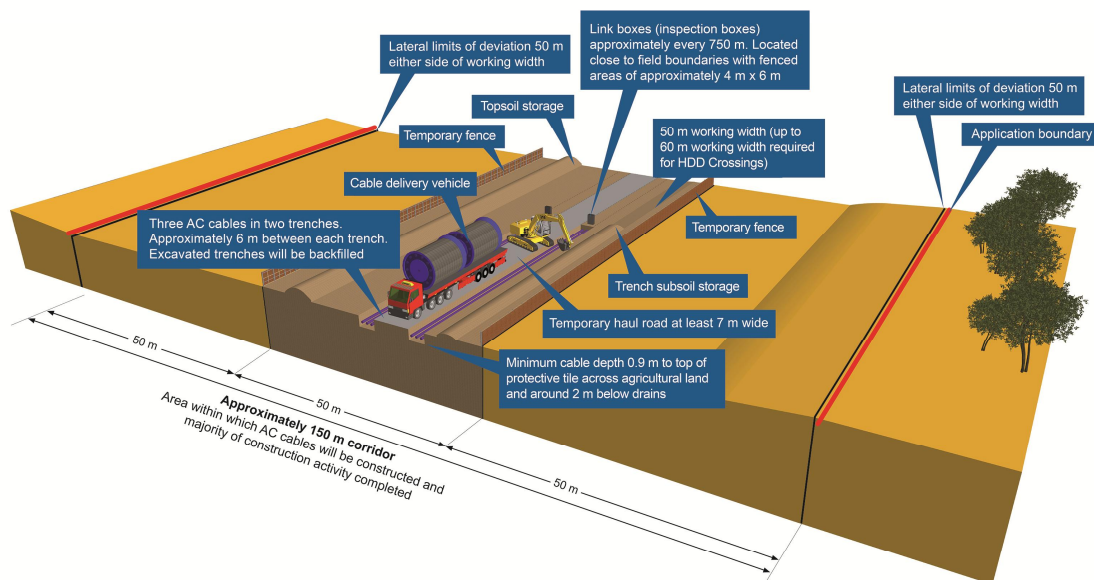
Typical Cross-Section of the AC Cable Route Corridor
